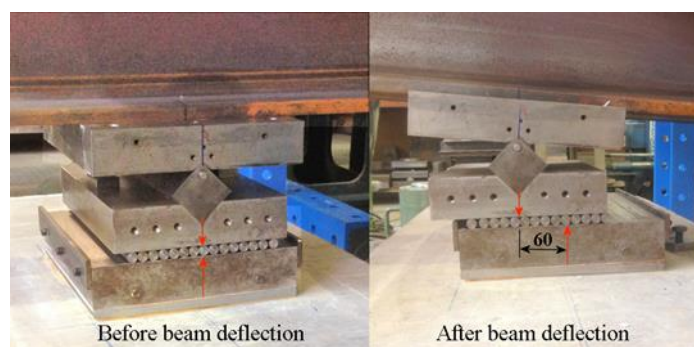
Roller bearing support (left end) between concrete block and steel beam
